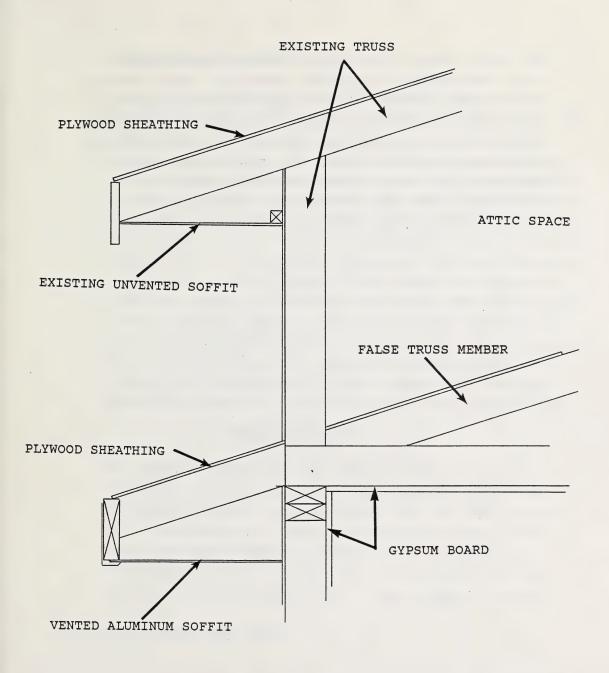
Schematic of the Soffit Modifications Made to the Test House
